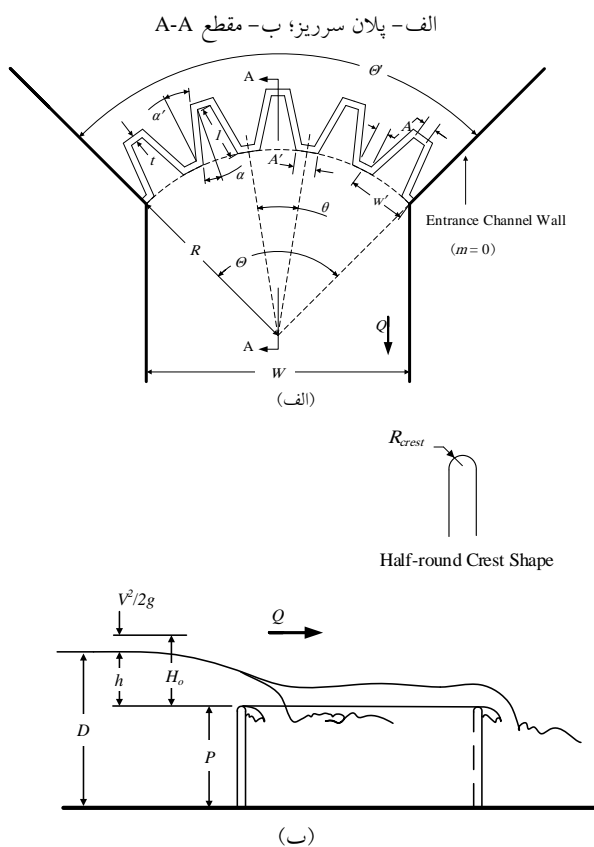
Geometric and hydraulic parameters of an arced labyrinth weir: right) Plan view, left) section view A-A
